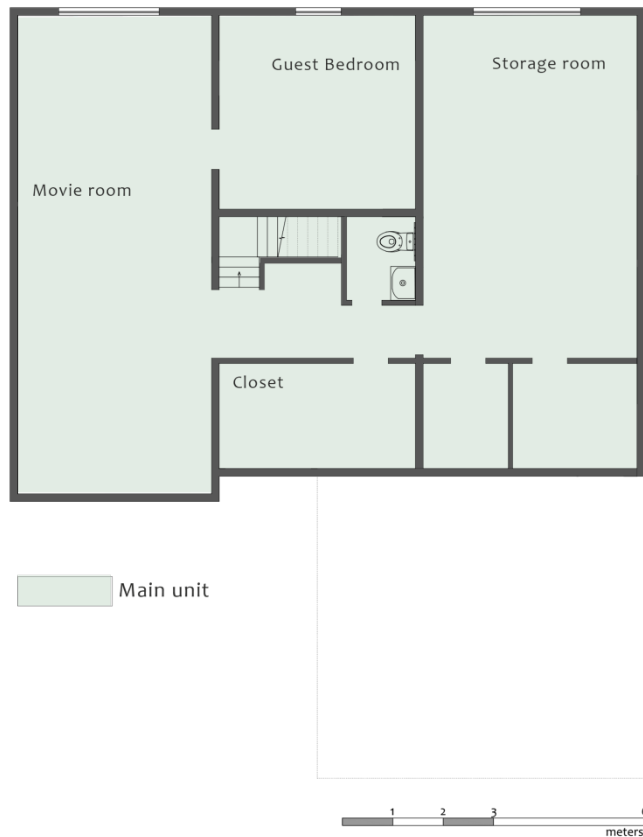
Basement plan. The basement was part of the main unit and was used as a common family space. This floor was most often occupied by the youngest generation (Nora's daughter), and was called the "party floor"
